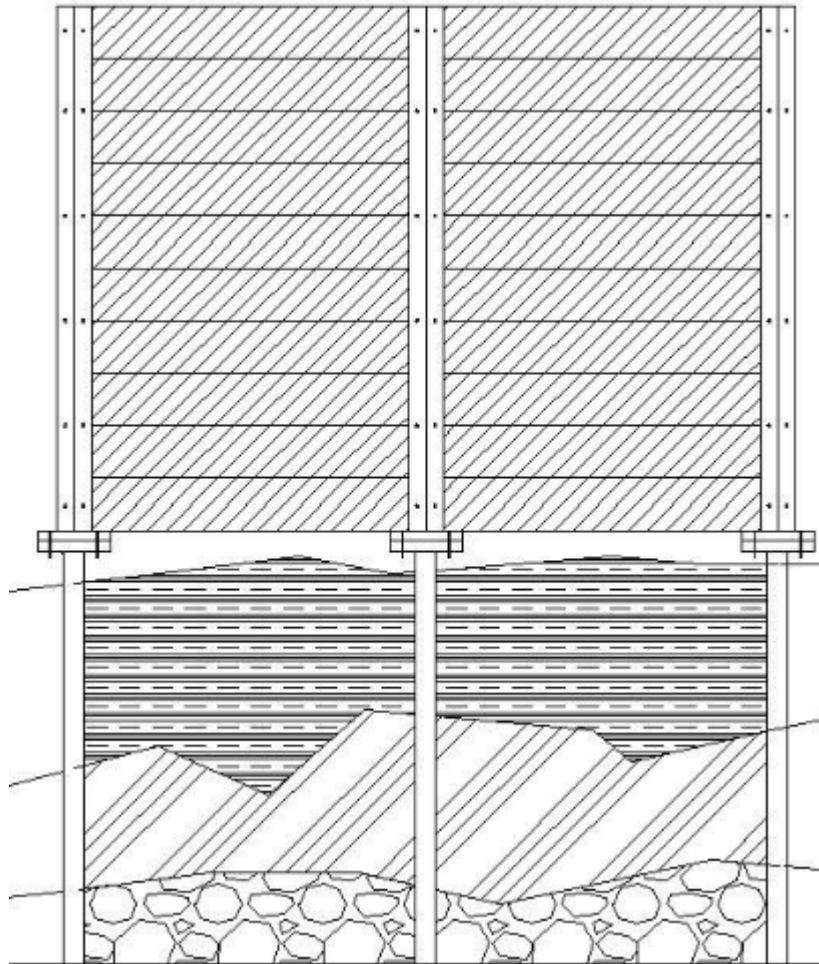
A basic design of the Hempcrete wall with steel columns and steel piles
